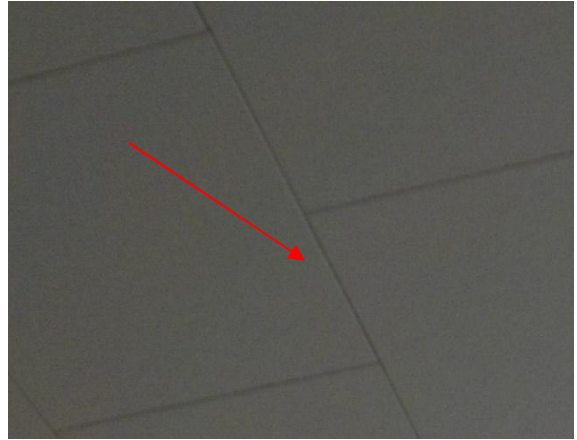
HA 16: Asbestos-Containing (2% Chrysotile) Brown Glue Dots Associated with (beneath) Non-Asbestos-Containing 1'x1' White Ceiling Tiles (Building 9).
